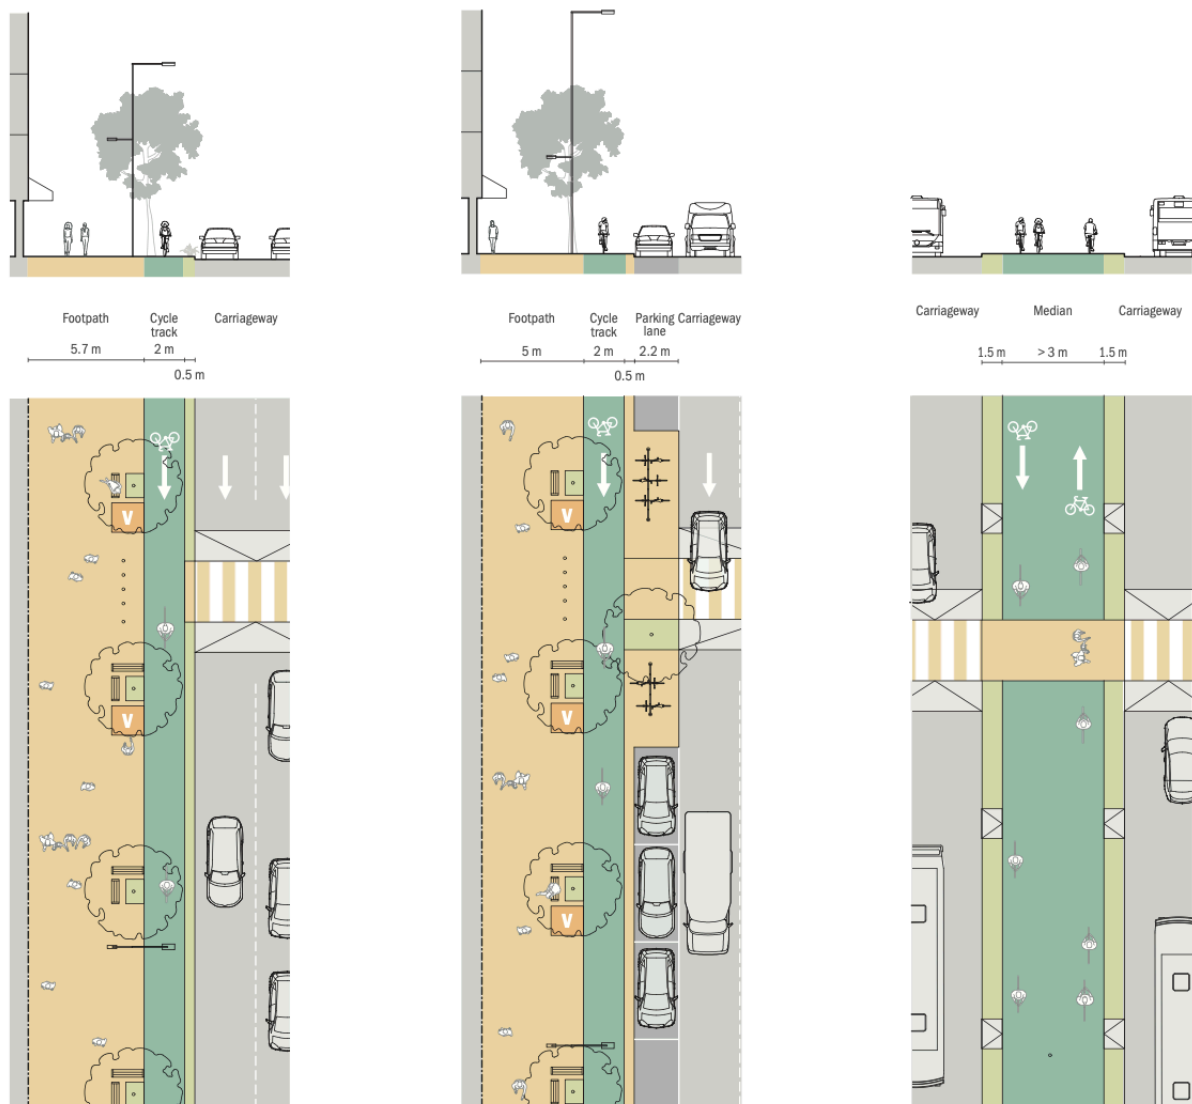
Cycle tracks should have a minimum width of 2 m and an elevation of 150 mm above the carriageway. Trees provide shade and comfort for cyclists.
